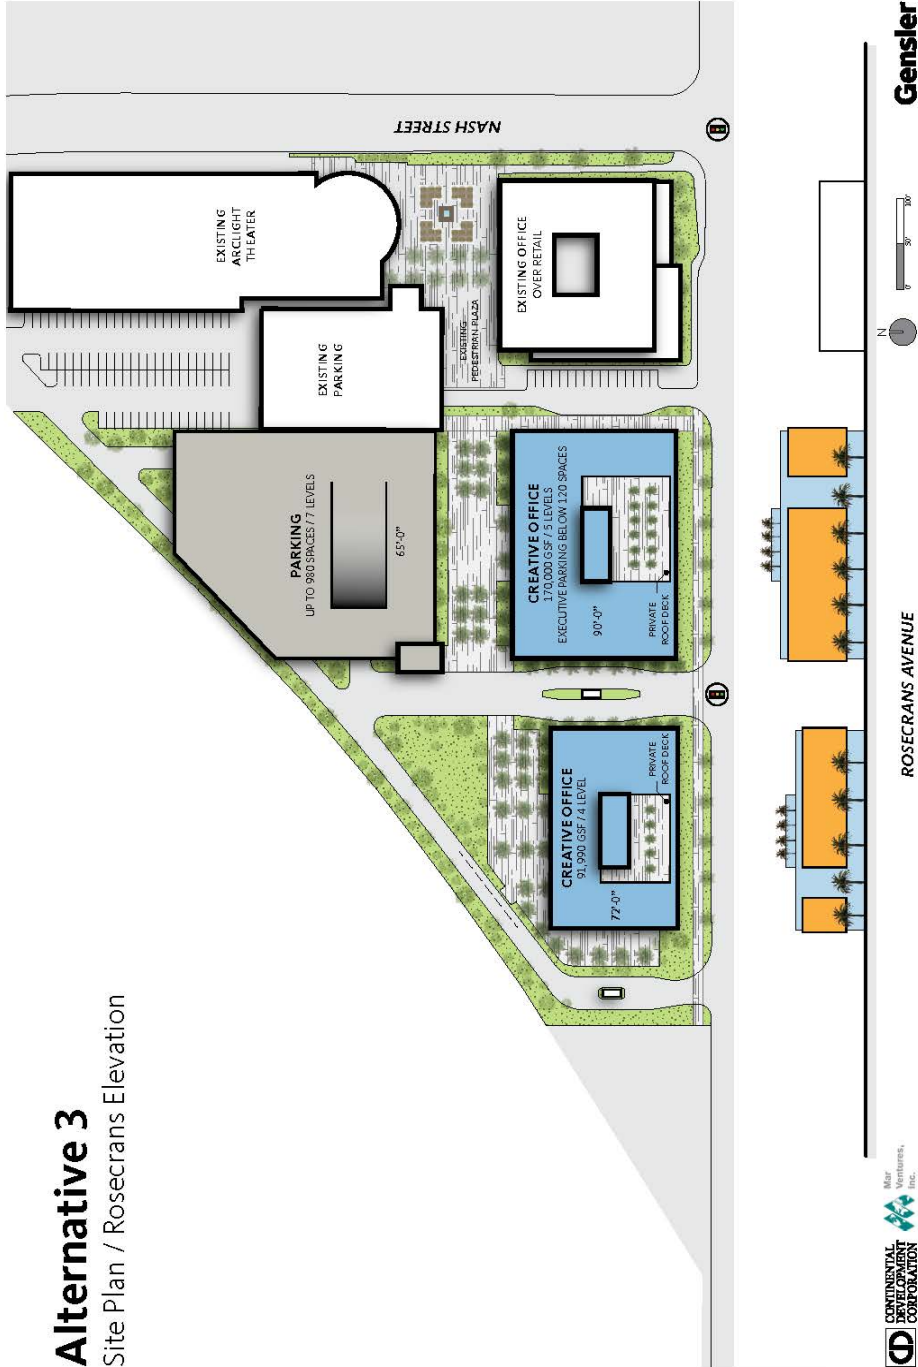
EXHIBIT E SITE PLAN FOR ALTERNATIVE 3
